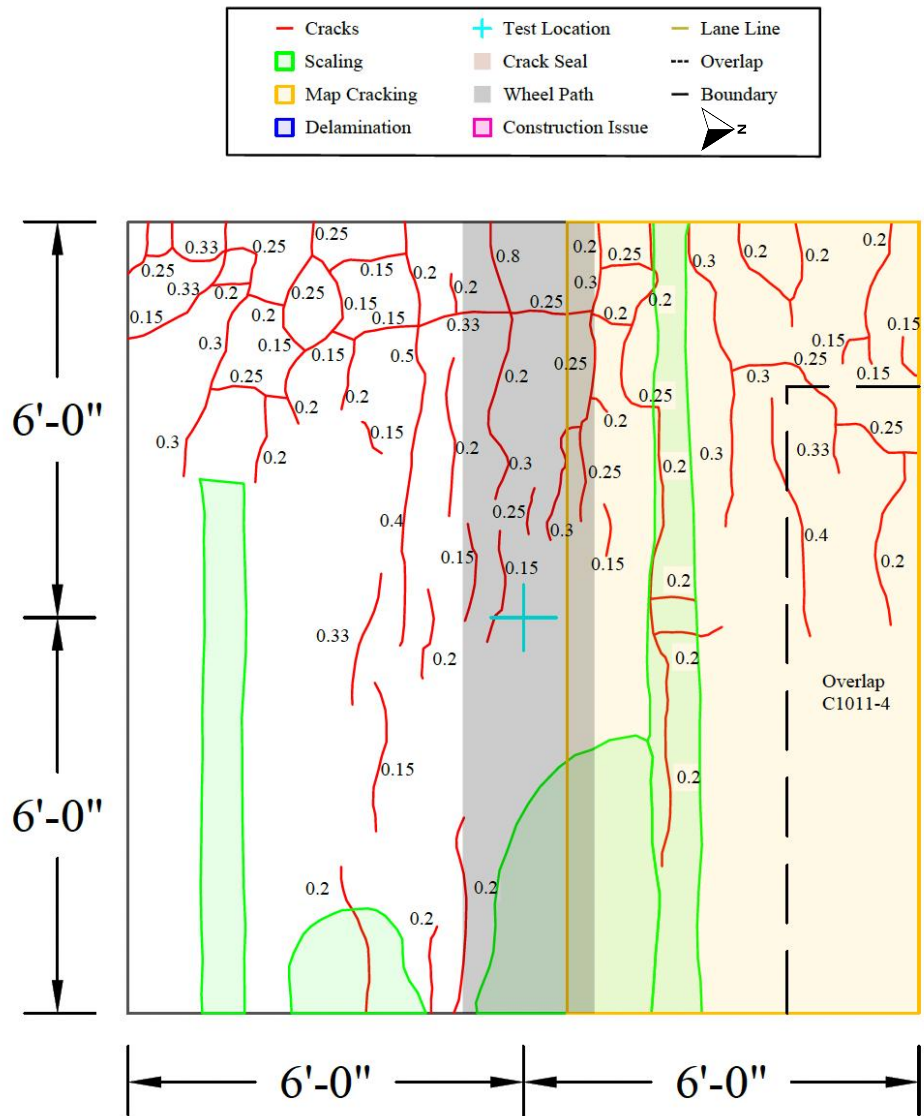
Test location 5 of lightweight concrete deck at bridge C-1011.
